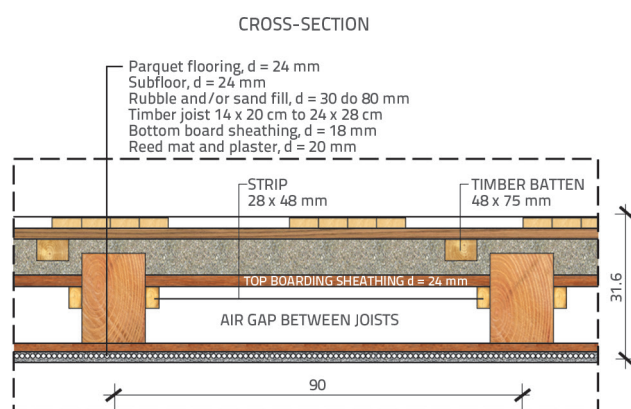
Cross-section of a floor structure with traditional timber joists with recessed infill
